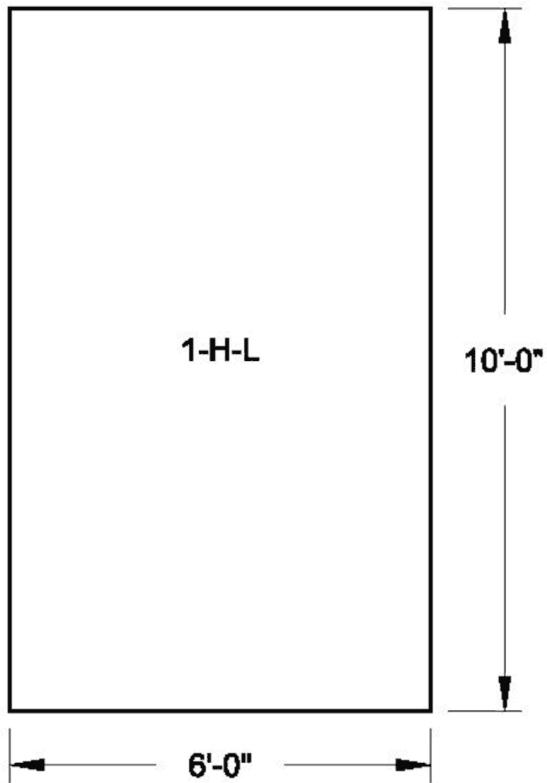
H.6-158 DGFOSV Roof 5 Looking Down
